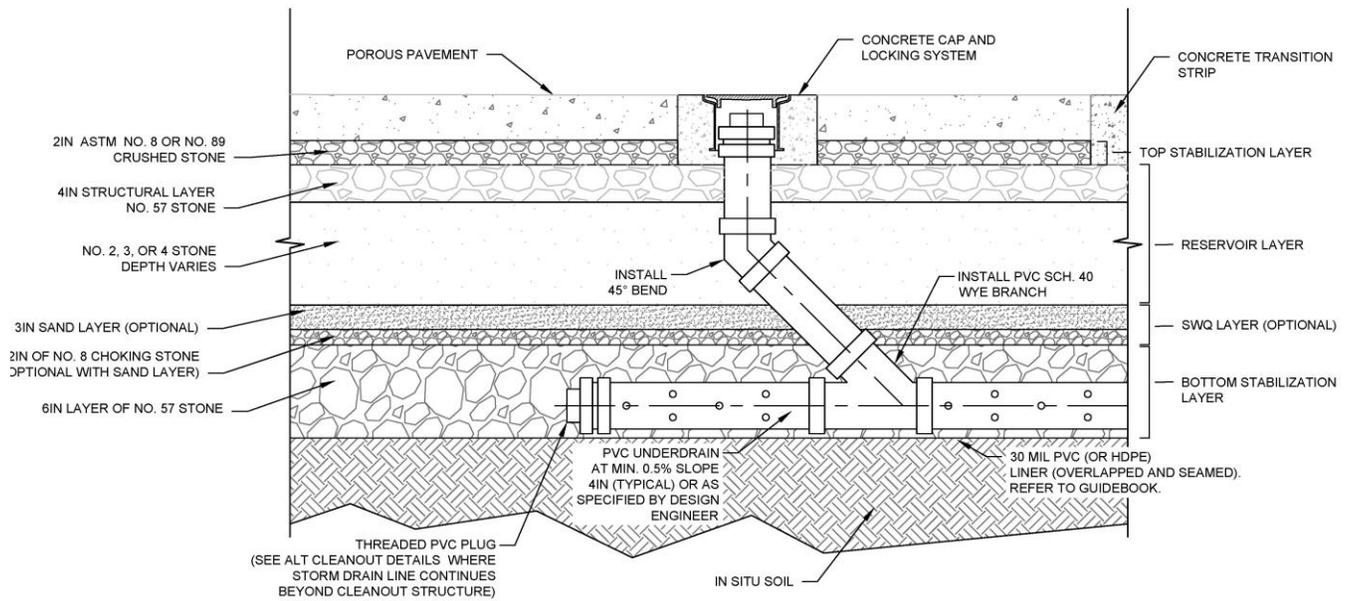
POROUS PAVEMENT TYPICAL SECTION
